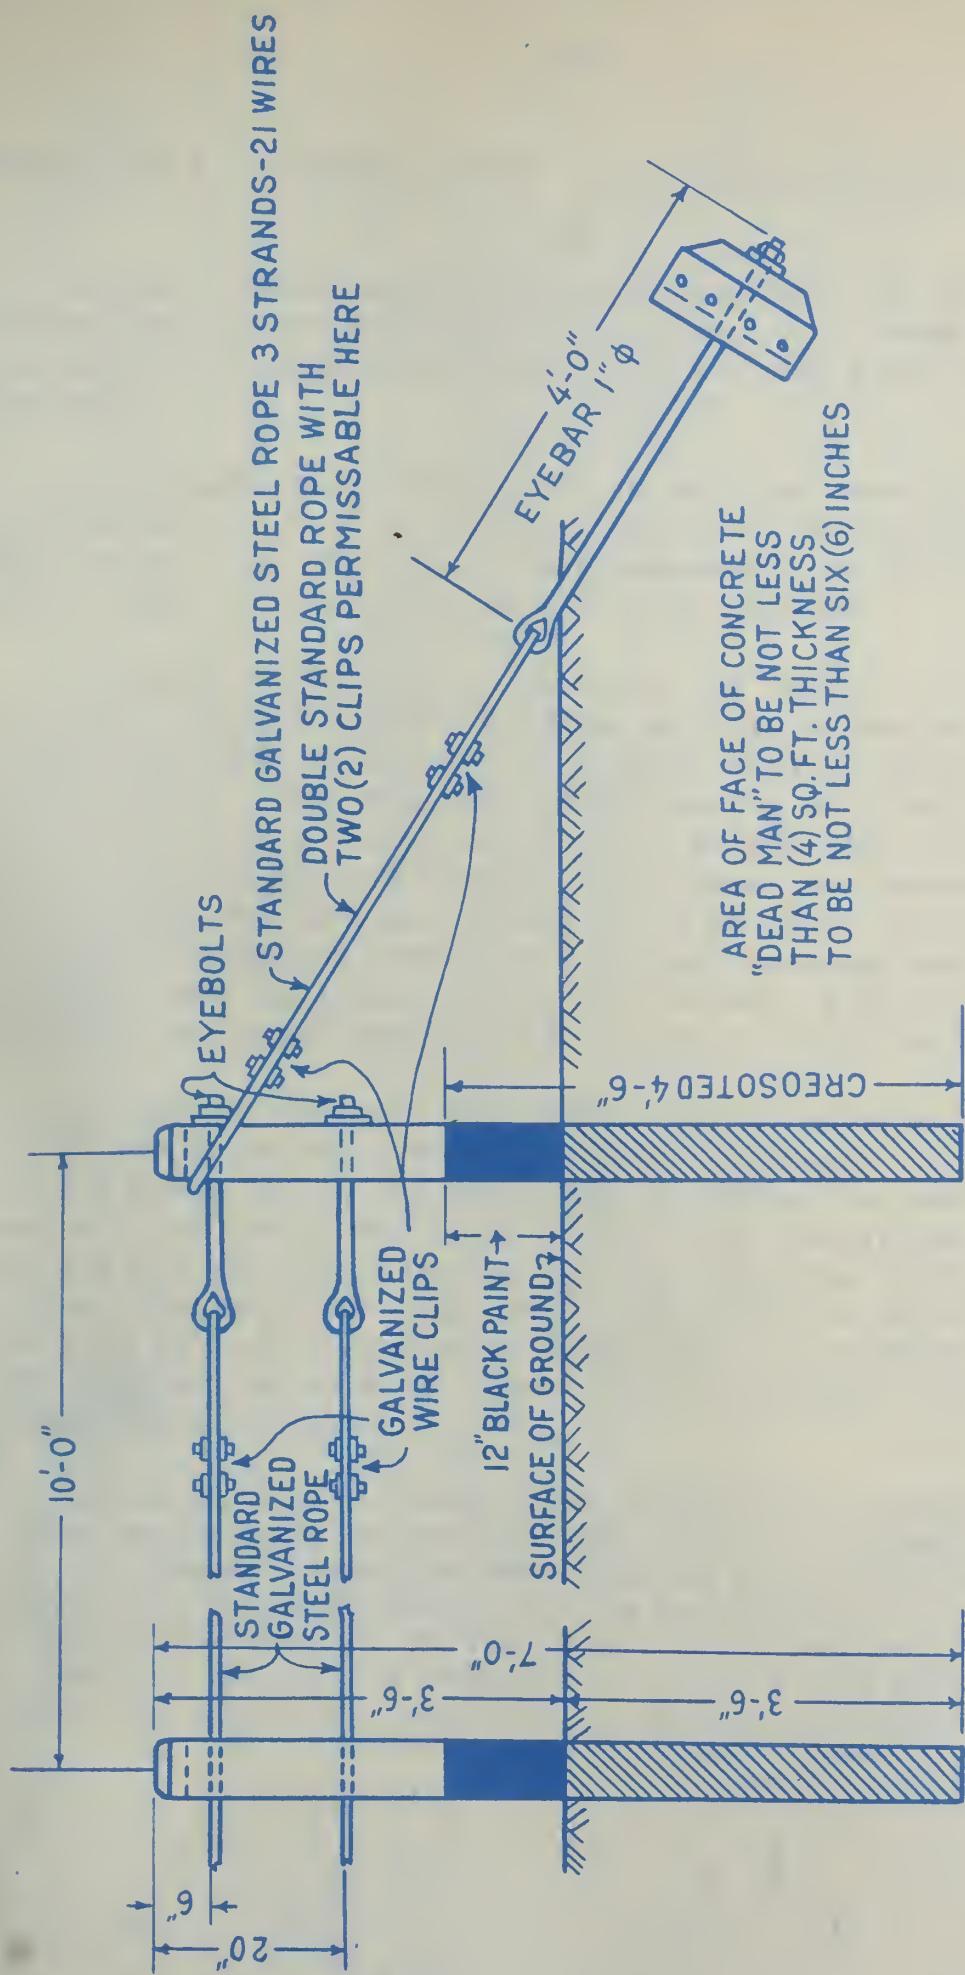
DIMENSION DRAWING OF STANDARD PENNSYLVANIA WIRE-ROPE GUARD RAIL
